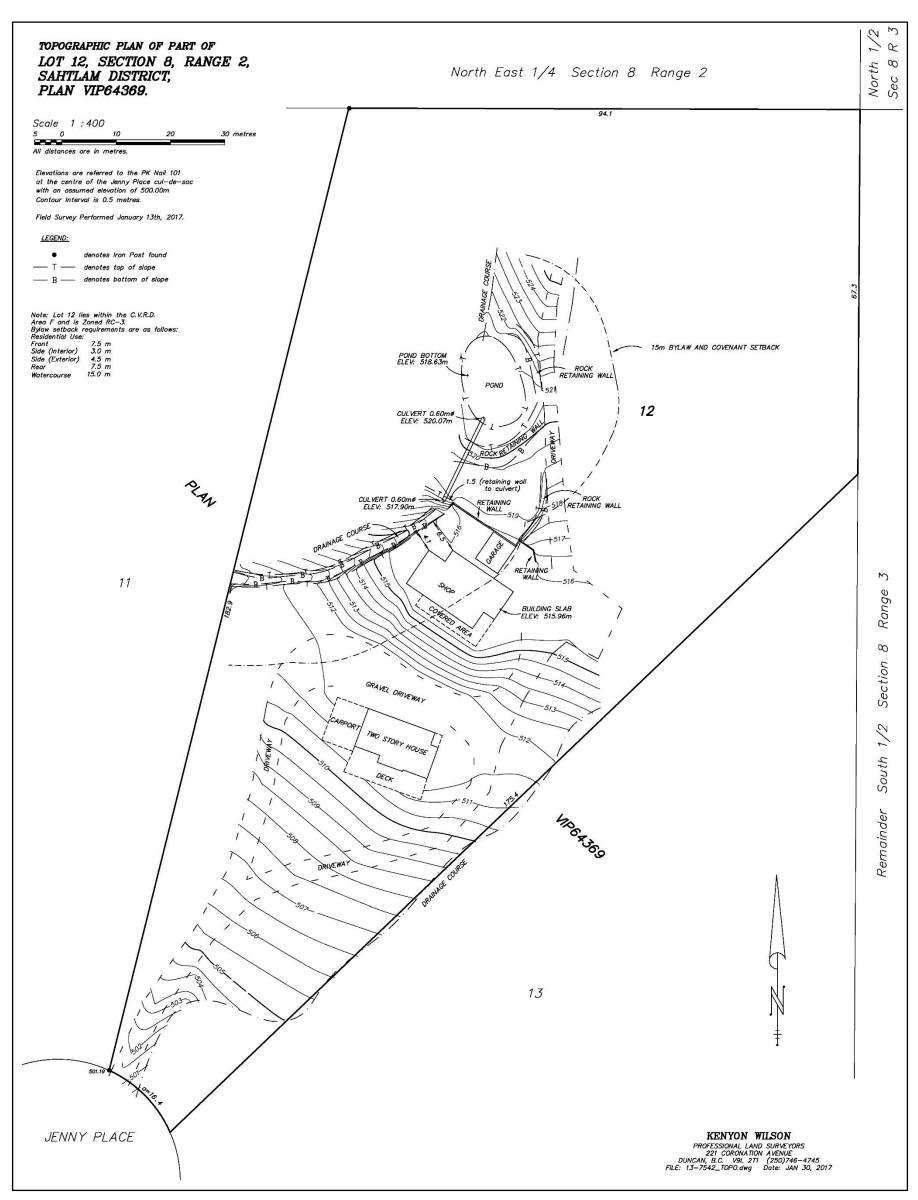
Survey Plan of 5525 Jenny Place showing the location of the creek, pond, retaining wall, buildings and other structures.
